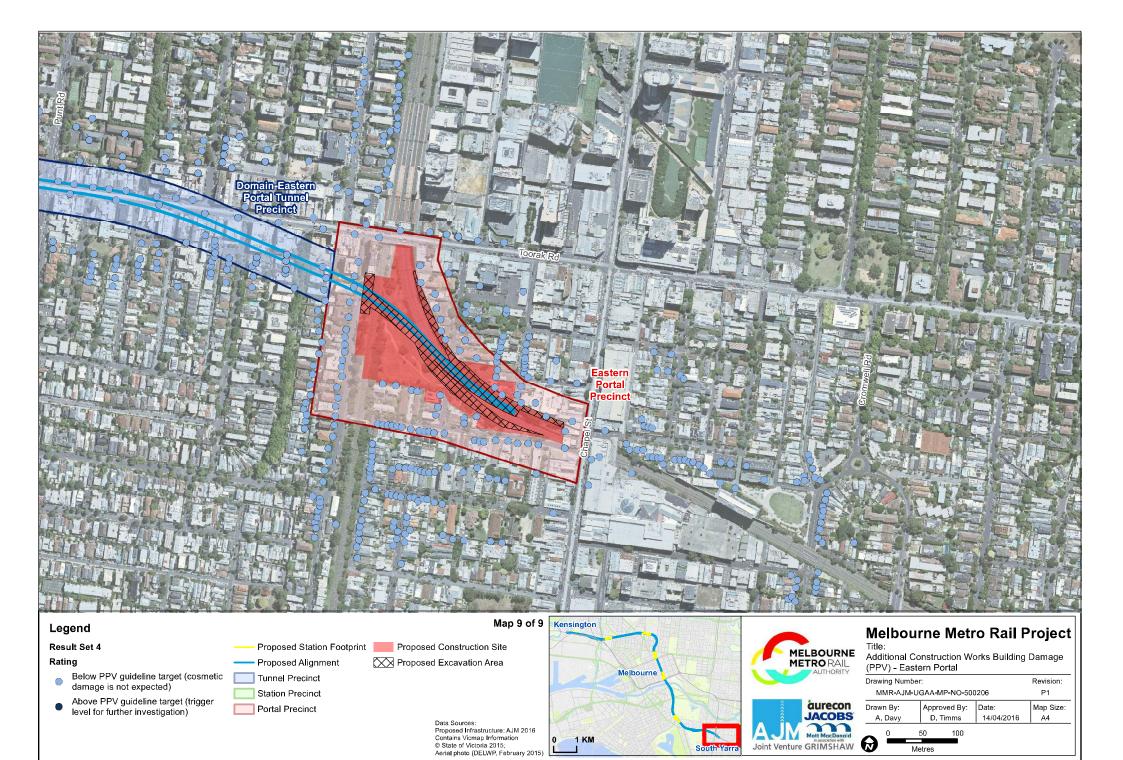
Colour coded building damage assessment due to Additional Construction Works - Eastern Portal Precinct
